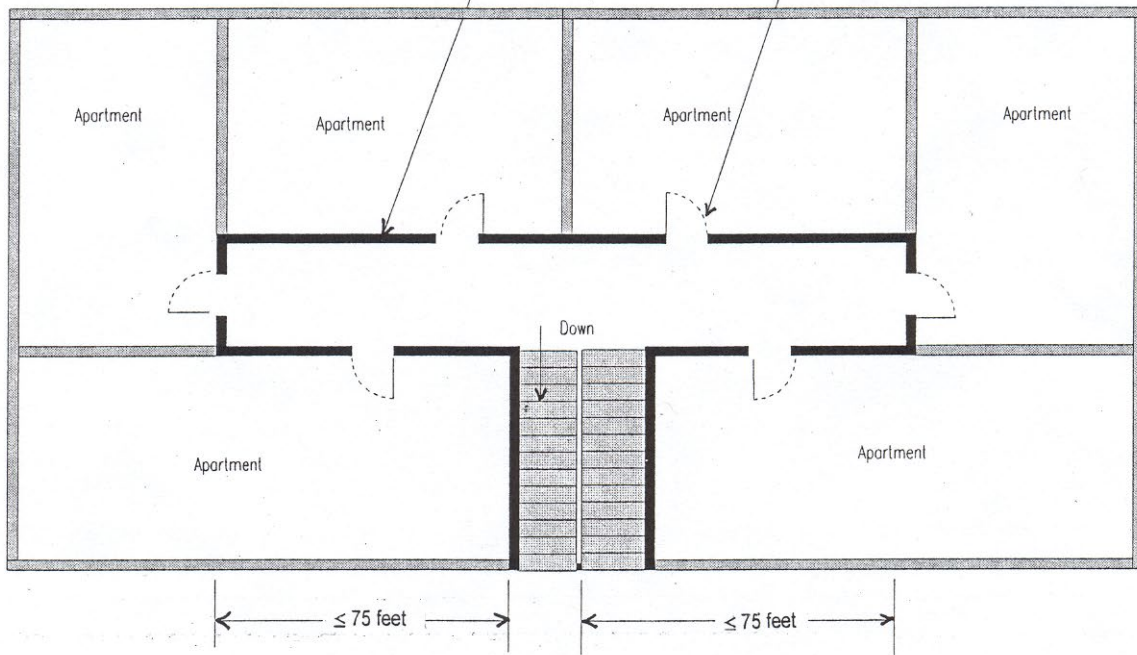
C. Interior exit enclosure for a building with one interior exit and one fire escape or exterior stair.
